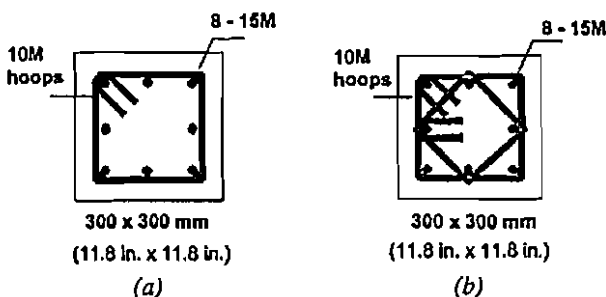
Cross-sectional details for: (a) A-B-D series specimens; and (b) C-series specimens.
